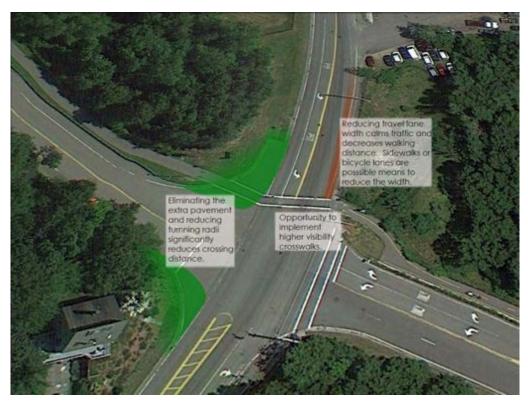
Potential improvements to ARRT Crossing at Fitchburg Street
